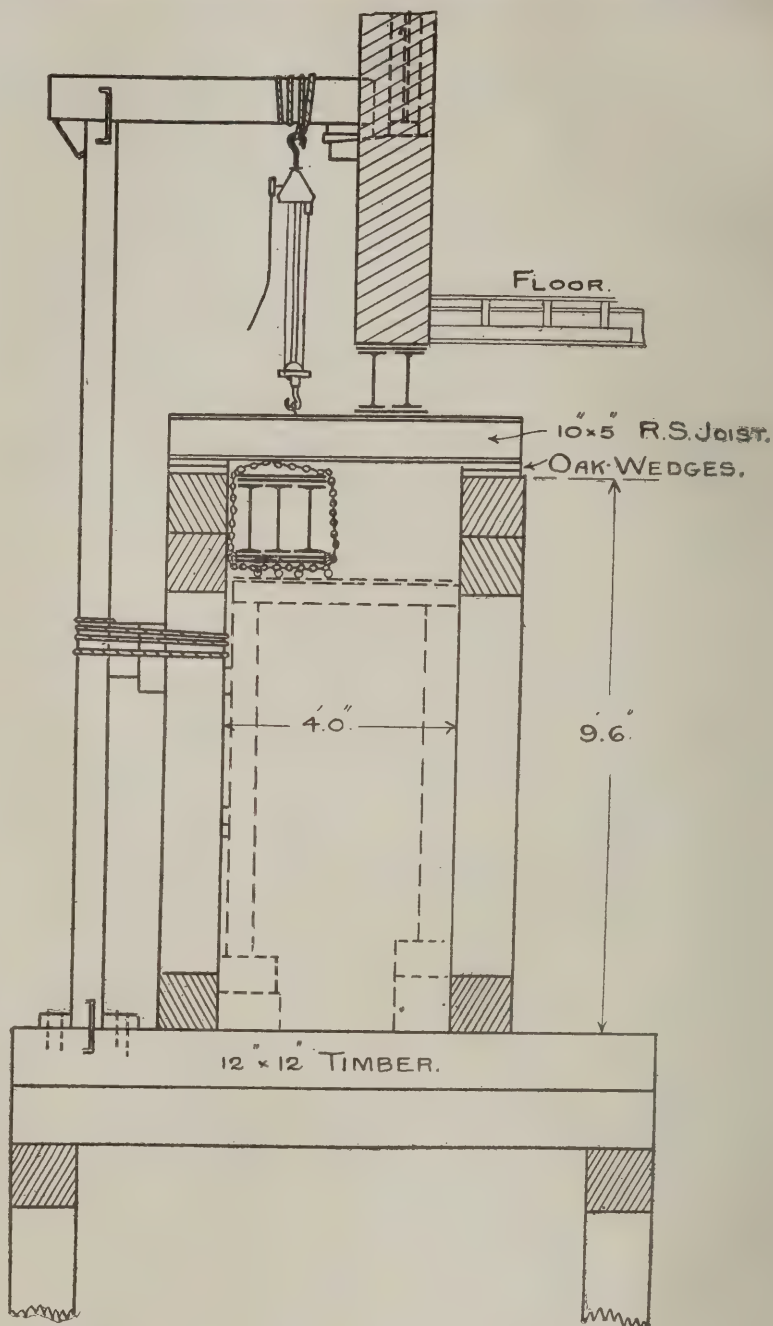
TOP BAY OF SHORING STAGE, SHOWING GIRDER LIFTED AND READY TO DROP ON ROLLERS.
